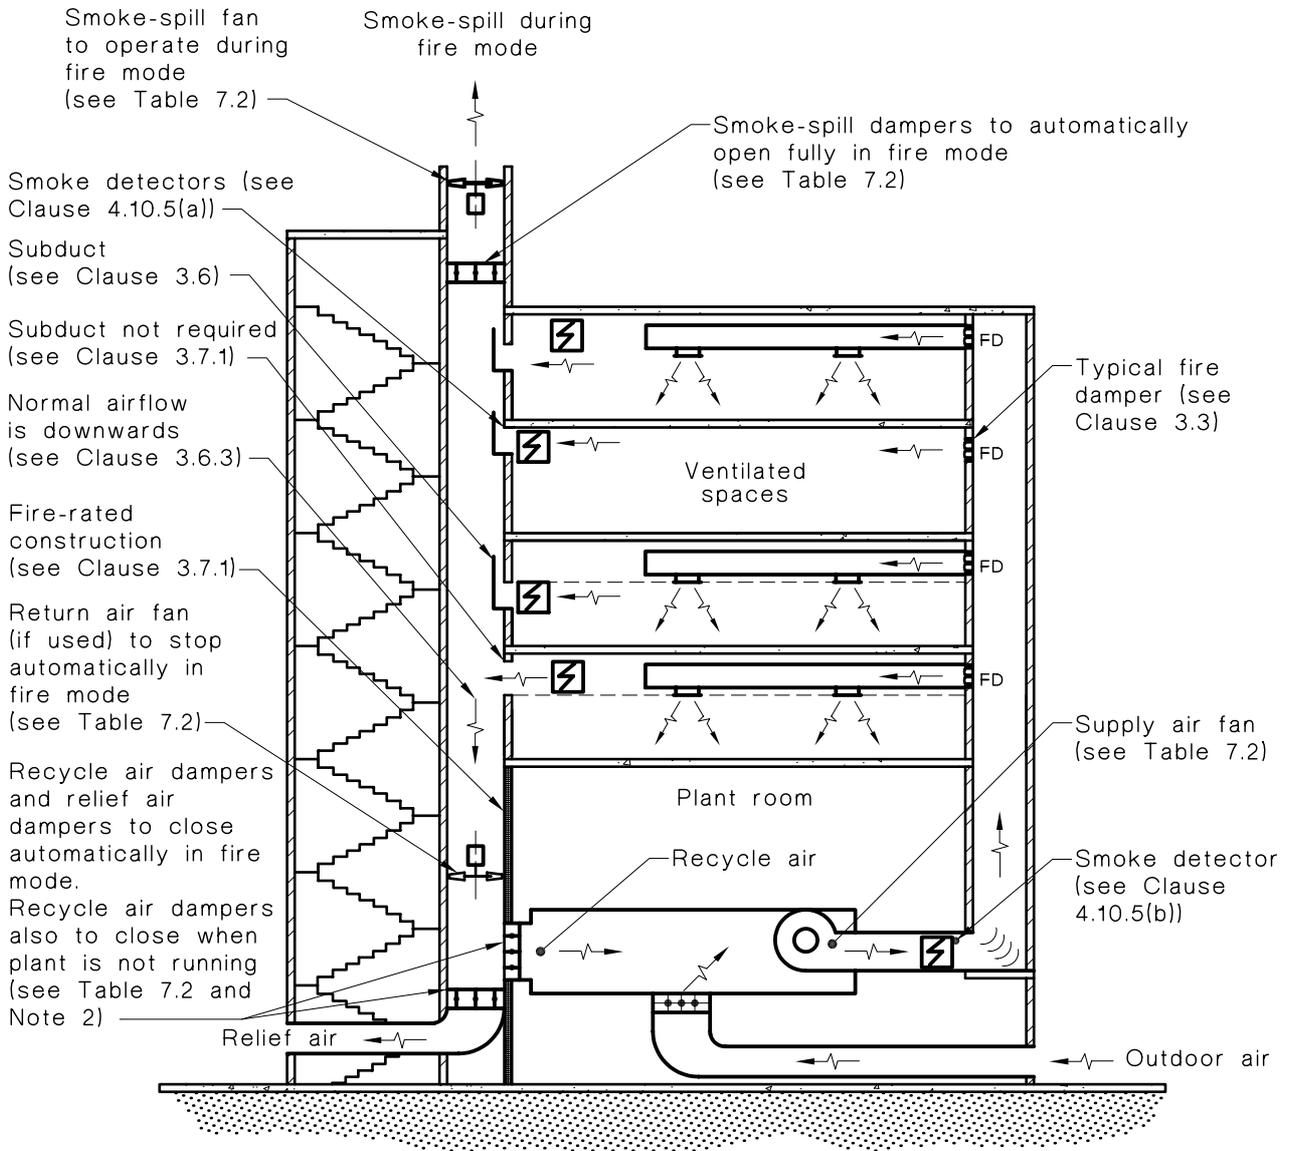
AIR PURGE SYSTEM—TYPICAL INSTALLATION WITH PLANT ROOM BELOW SPACE BEING SERVED
